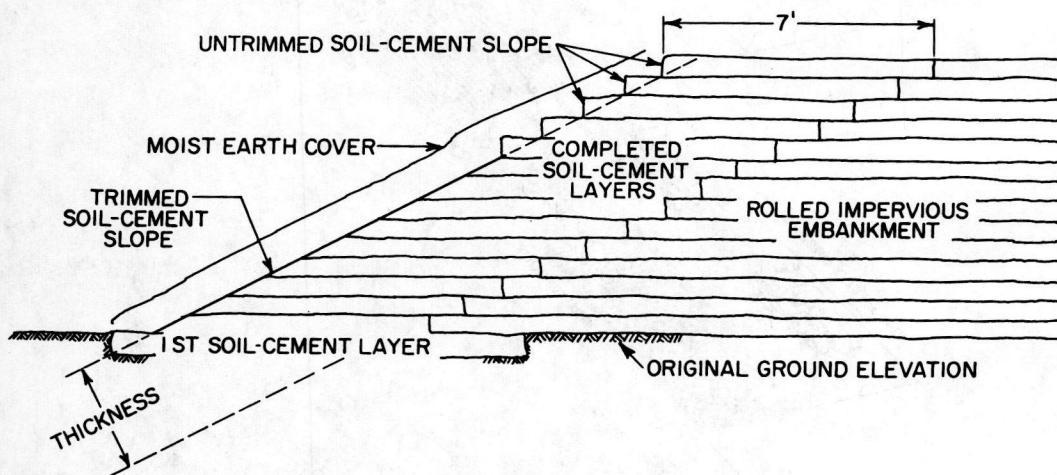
Some details of multiple-lift thick facings for embankments subject to inundation and wave action (95, 185).
